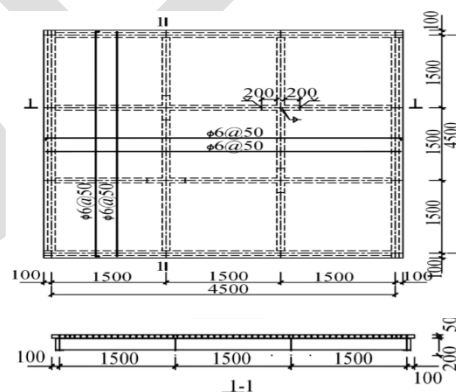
Overall view of specimen (dimensions in millimeters) [8]
